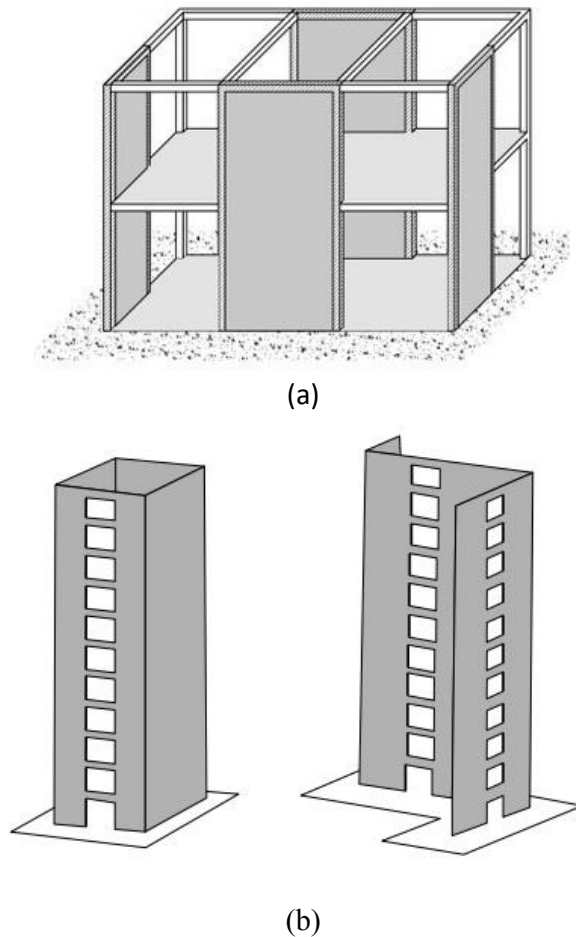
Illustration of (a) shear walls and (b) coupled shear walls system [117]
